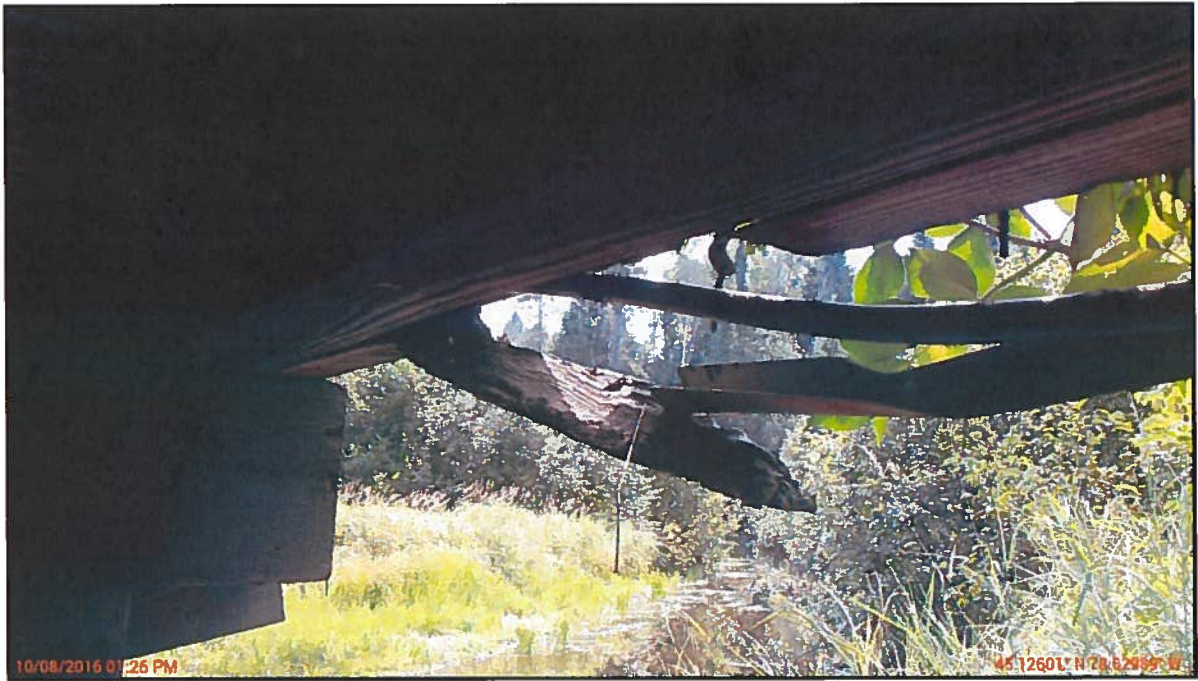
Damaged Exterior Wood Beam – Northwest Quadrant
